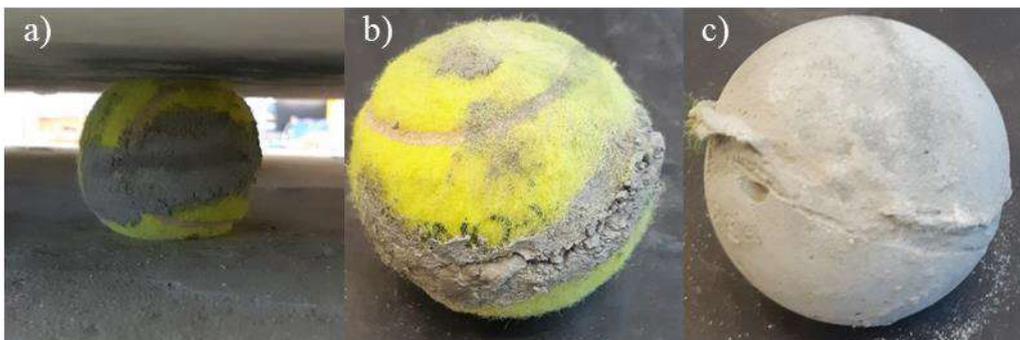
Grout rolling isolator cast in tennis balls, a) under compression between two concrete plates, b) after cyclic testing, c) detail of the grout core
